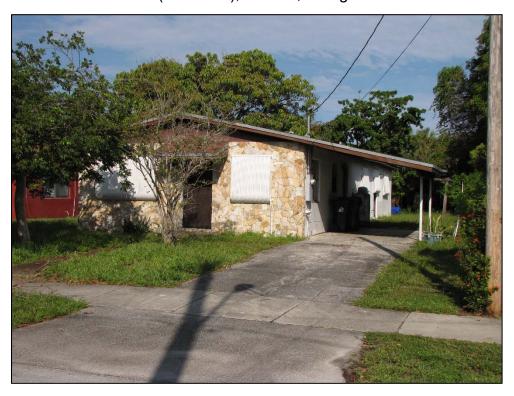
| 412 NW 21st Terrace (8BD6313), c. 1962, facing Northeast
